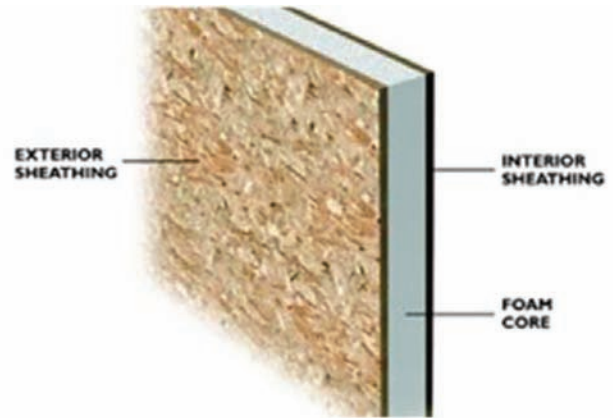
Structural insulated panels. (Source: <https://www.cascadetimberframes.com/sip-panels/>)
